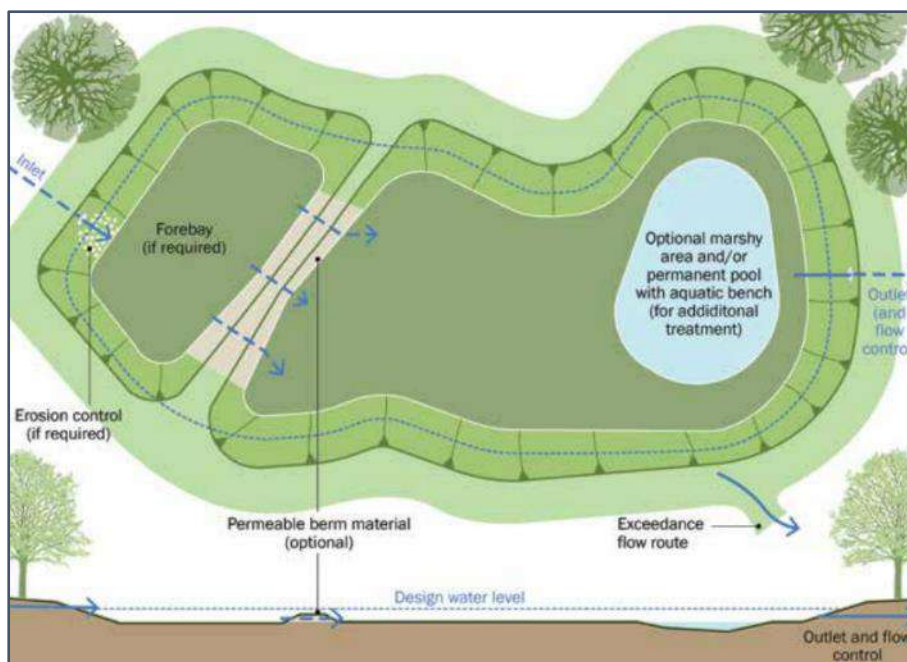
Plan and Section of a Typical Detention Basin (SuDS Manual)
